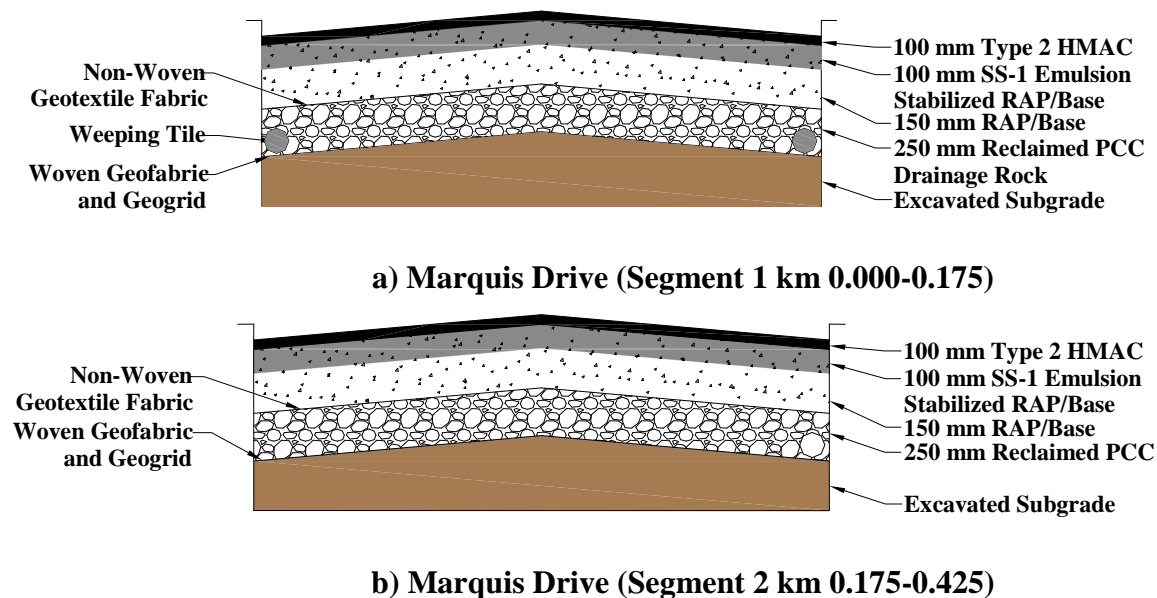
Post Construction Cross Sections of Marquis Drive
